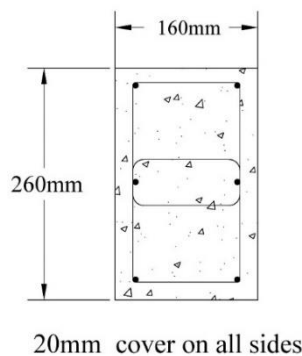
A schematic of cross section and reinforcement arrangement [39].
